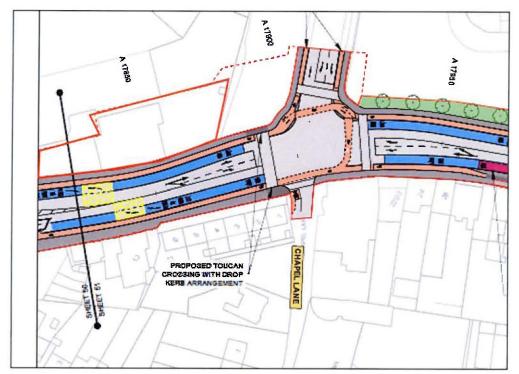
Scheme Plan for Bray, subject site generally outlined in red - East Side - (Source: Jacobs, 2023)
